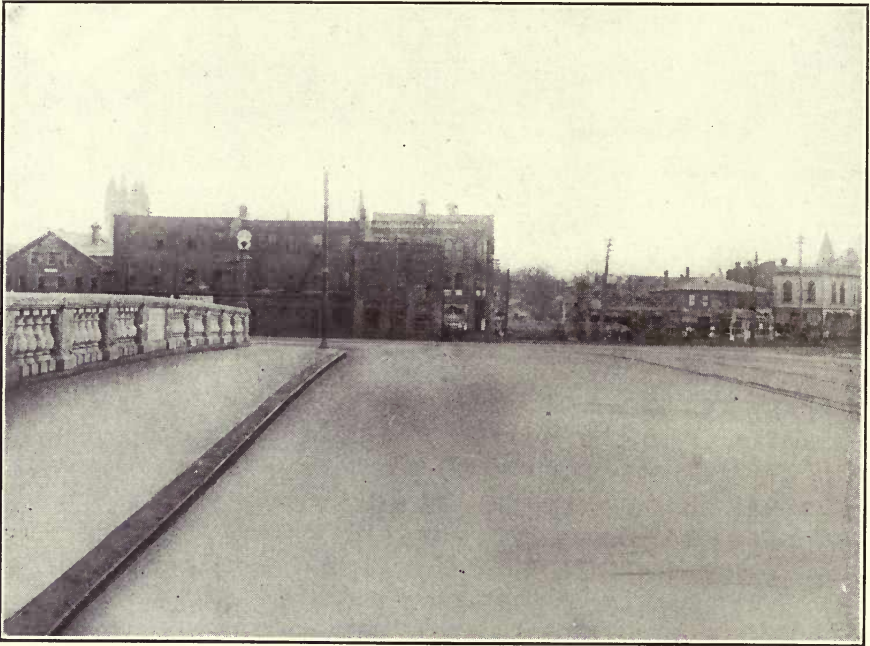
HASSAM PAVEMENT, WATERTOWN, MASS.
